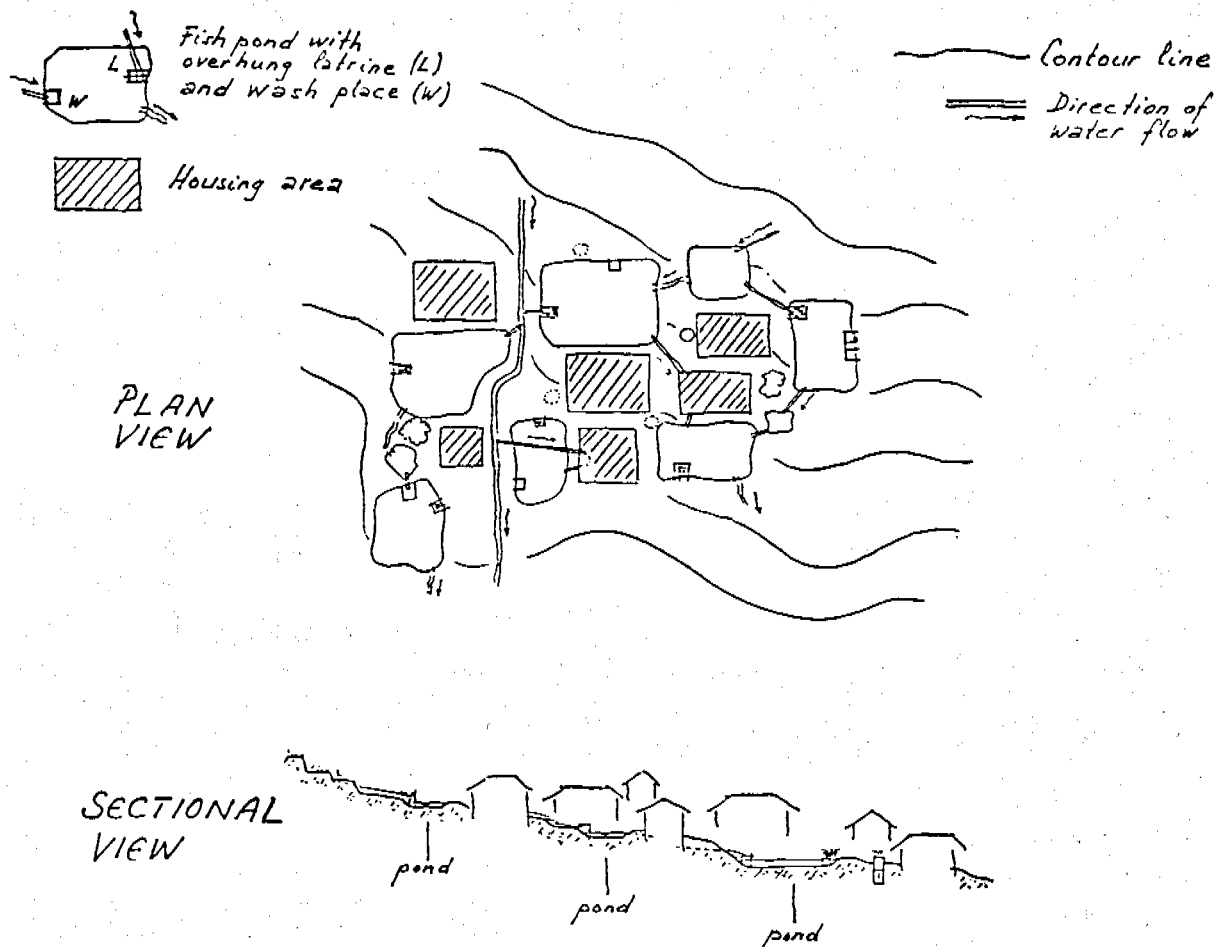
Sectional and Plan View of a Village with Fishponds (schematic)
